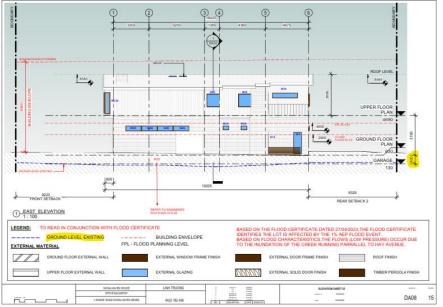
Proposed eastern elevation noting 800mm of fill proposed (ground level existing and relevant fill notation highlighted in yellow)
